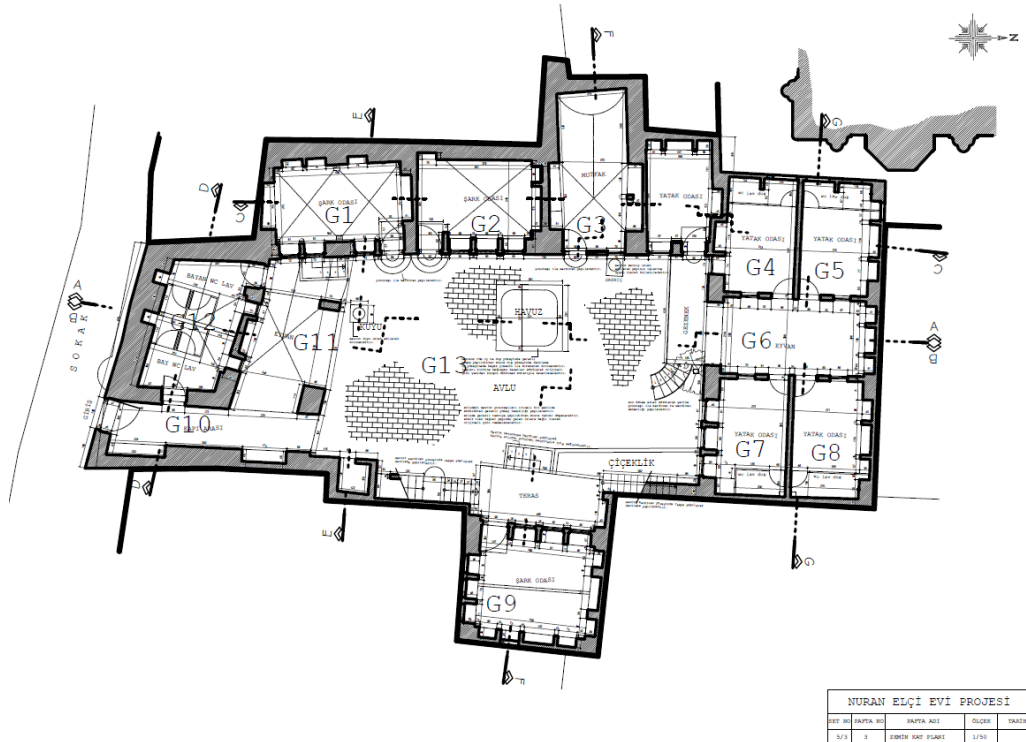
Nuran Elçi mansion restoration project ground floor plan (TEMA 2008: 50)
